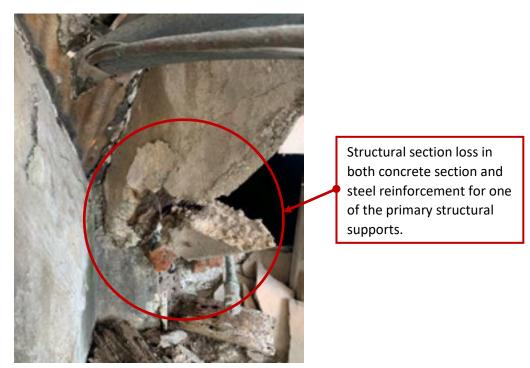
Severe concrete spalling and corroded steel reinforcing at existing primary structural support.
